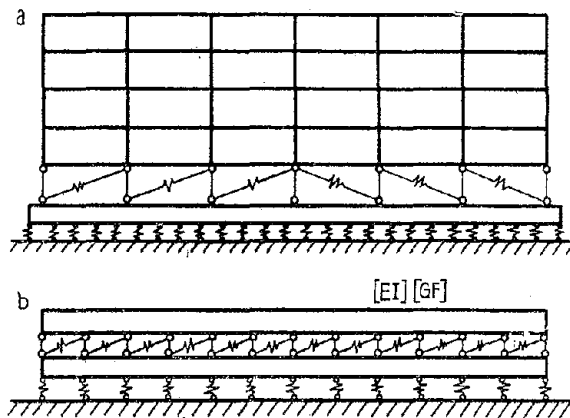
A continuous design model of a building with foundation. a—foundation with superstructure; b—foundation with equivalent superstructure.
